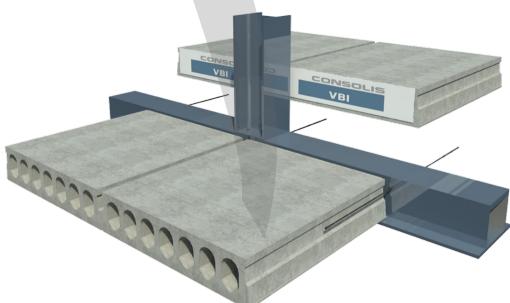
Detail of hollow-core floor to box-beam and column joint in the middle of the building
